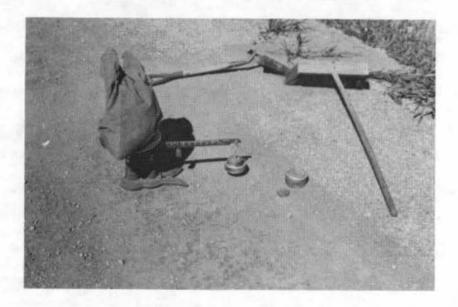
Loose roadway aggregate determination, summer 1971, Marion test road.
